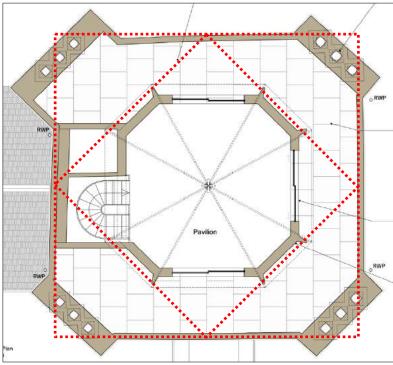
Plan of propozed prozpect room, zhowing root 2 geometrical relationzhip to the parent building.
